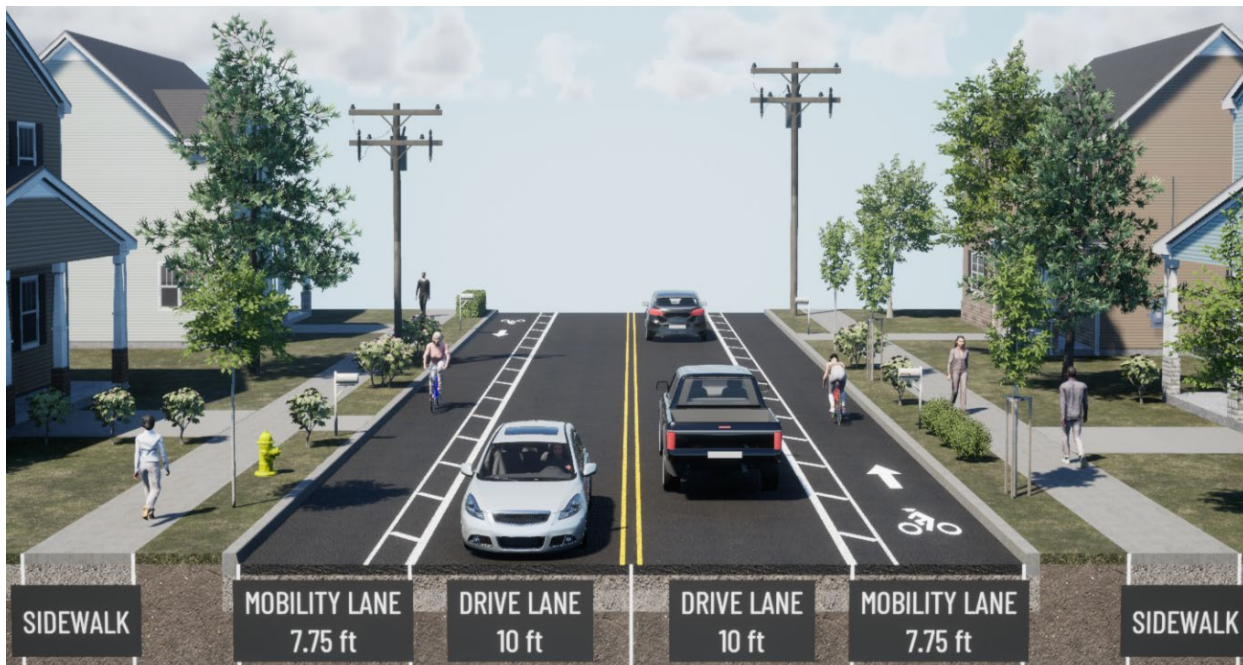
Recommended Cross-Section for 33rd Street between F Street and Grand Boulevard.
